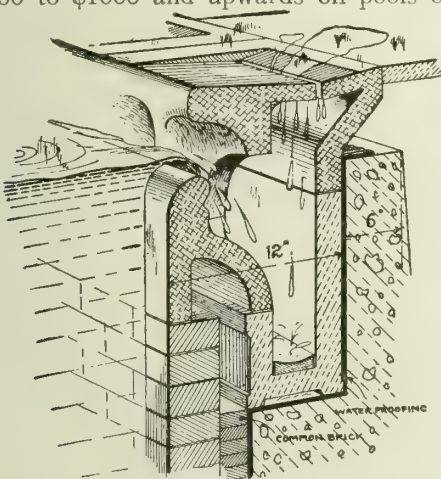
TRENCH GUTTER COMPOSED OF ALL TERRA COTTA UNITS—FOR 18 IN. WALL SECTION
